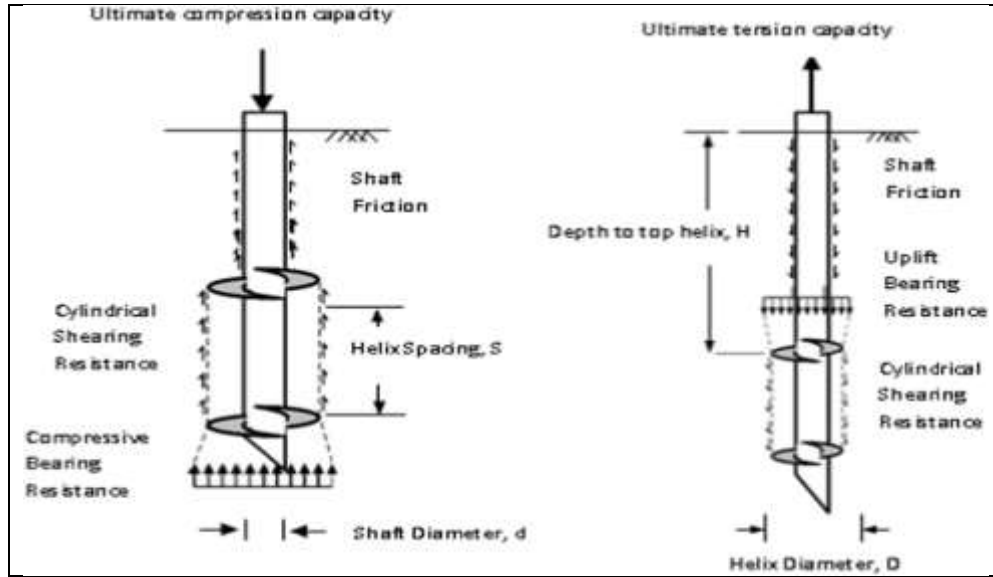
The Details of Cylindrical Shear Failure under Tension and Compression Loading [35]
